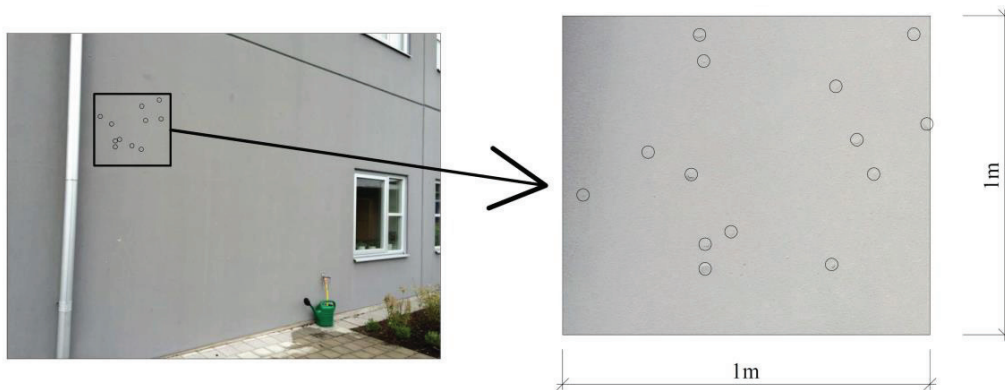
Defects in external layer of precast concrete insulated wall elements
